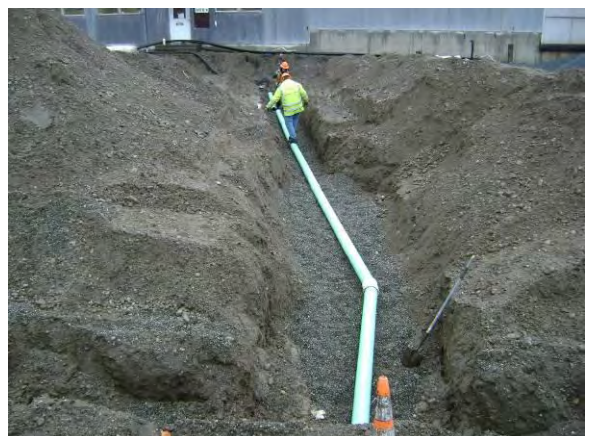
C: Utility reconstruction – sanitary sewer lateral connection for SuperValu building looking northeast.
